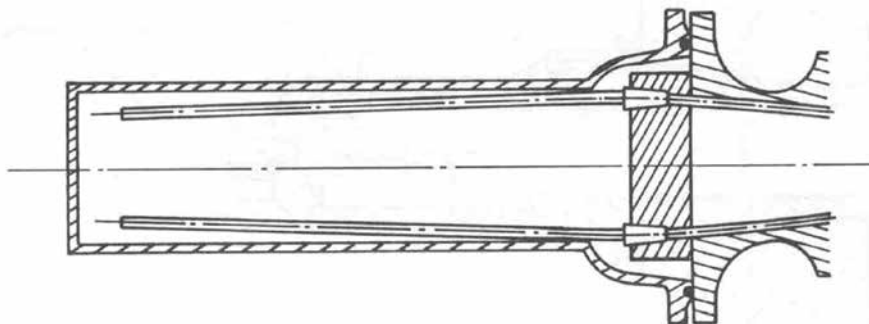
Protection Cap Over Anchorages to be Handled in Future
